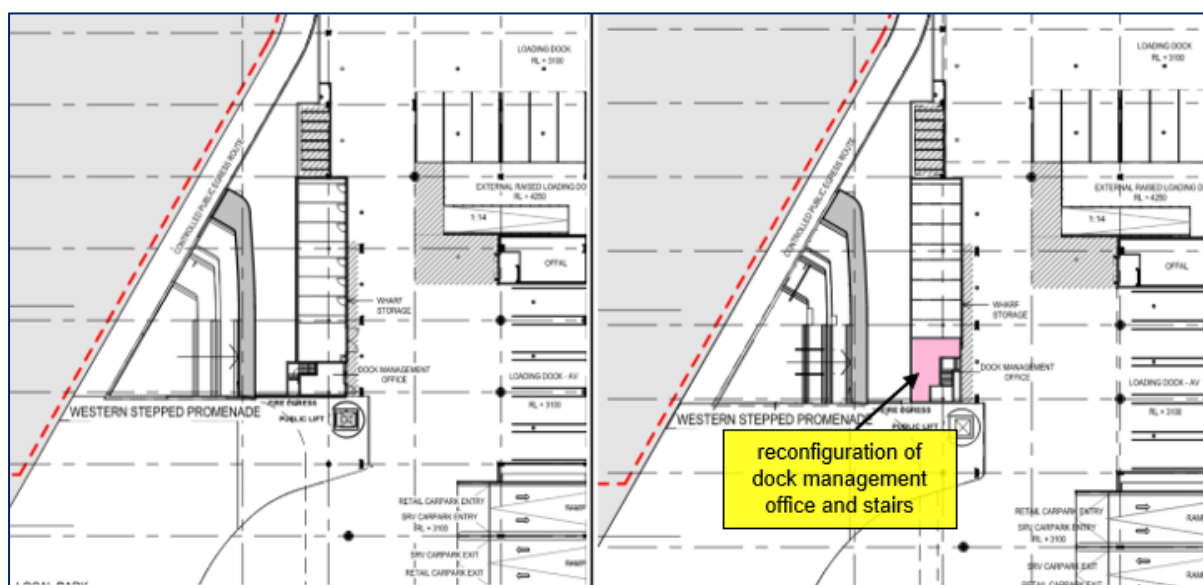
| The approved ground floor plan (left) and proposed (right) (base source: Modification Report)
